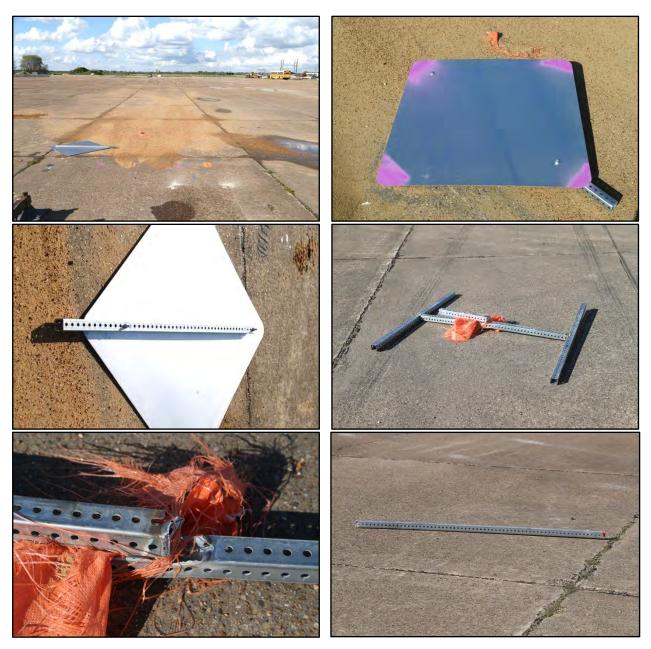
Option C Temporary Work Zone Sign Support after Test No. 490026-2-7.
